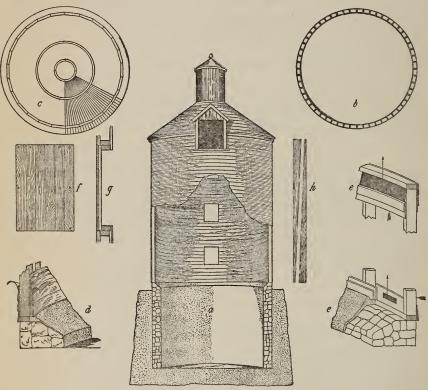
The Wisconsin round silo: a, interior view; b, cross section; c, roof, from below; d, top of foundation wall, sill, studs, and two layers of sheeting with tarred paper between; e, e, method of ventilating wall; f, door; g, door fitted into opening; h, boards for roof.
